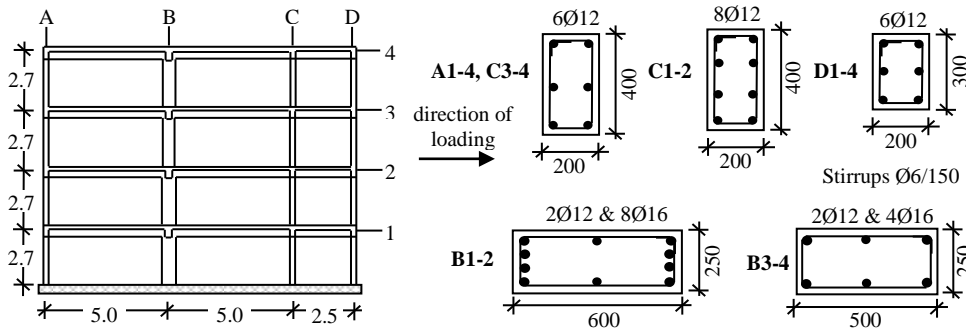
Configuration and cross-sectional detailing of existing frame.
